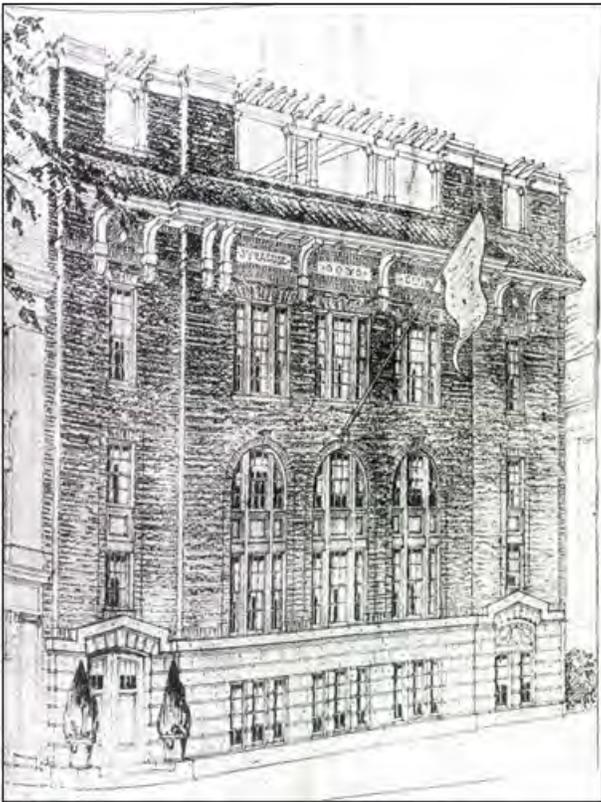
1920s sketch of original building plan. (Onondaga Historical Society)
